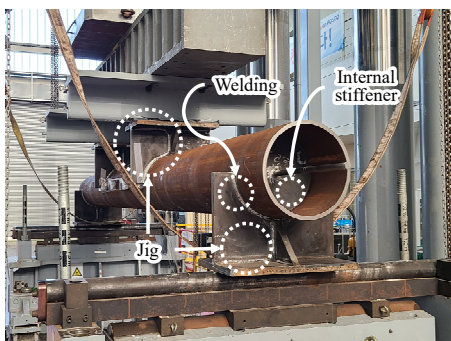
Steel pipe with welded jig and internal stiffener
